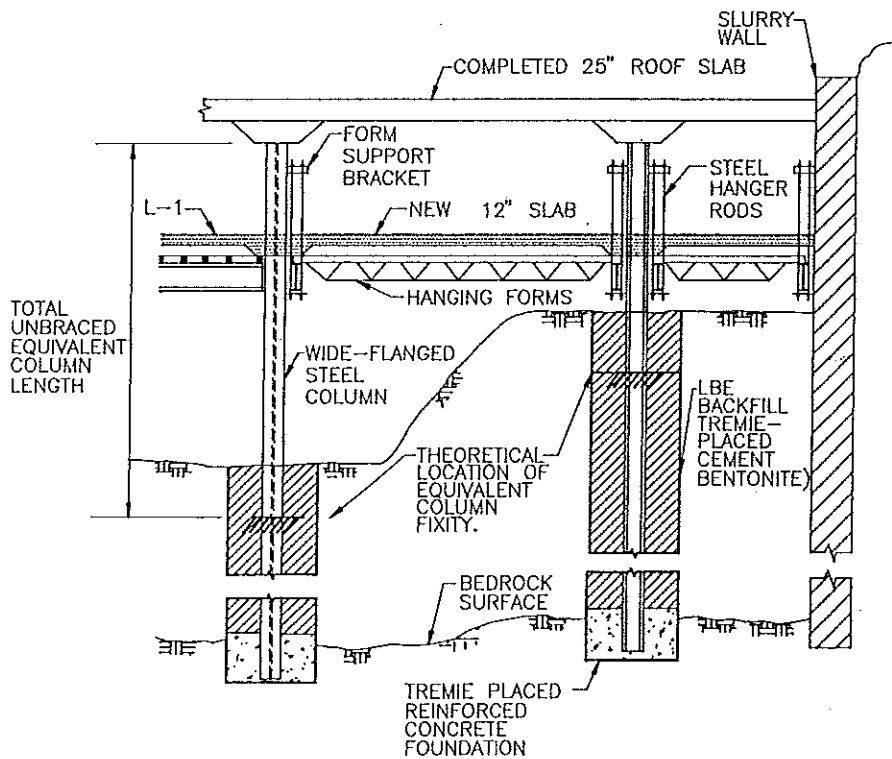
TYPICAL SECTION THROUGH LBE'S
